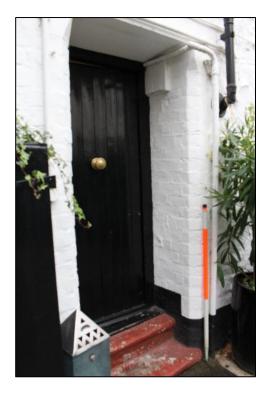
Detail of stop chamfer door opening within the 18th/early 19th century range.
